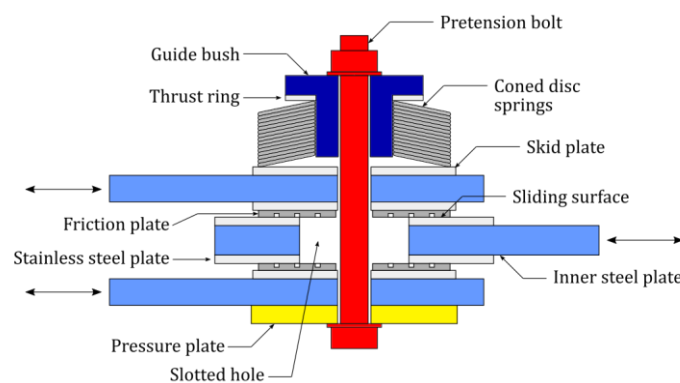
The layout of the axial dumper Tano et al. [33]
